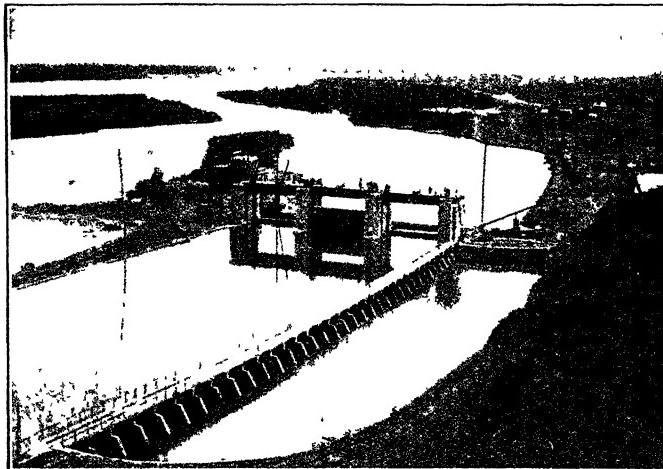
View of Yuma Canal and Sluiceway Showing Sluice Gates under Construction
